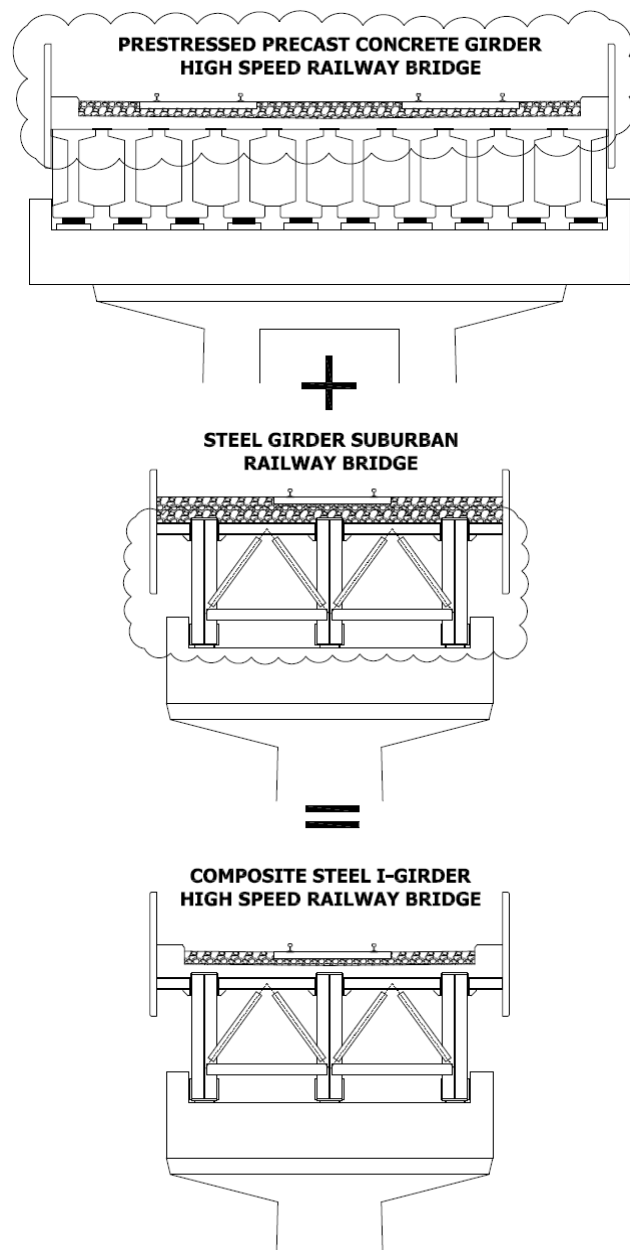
Formation of Non-Existing Composite Steel I-Girder Railway Bridge
